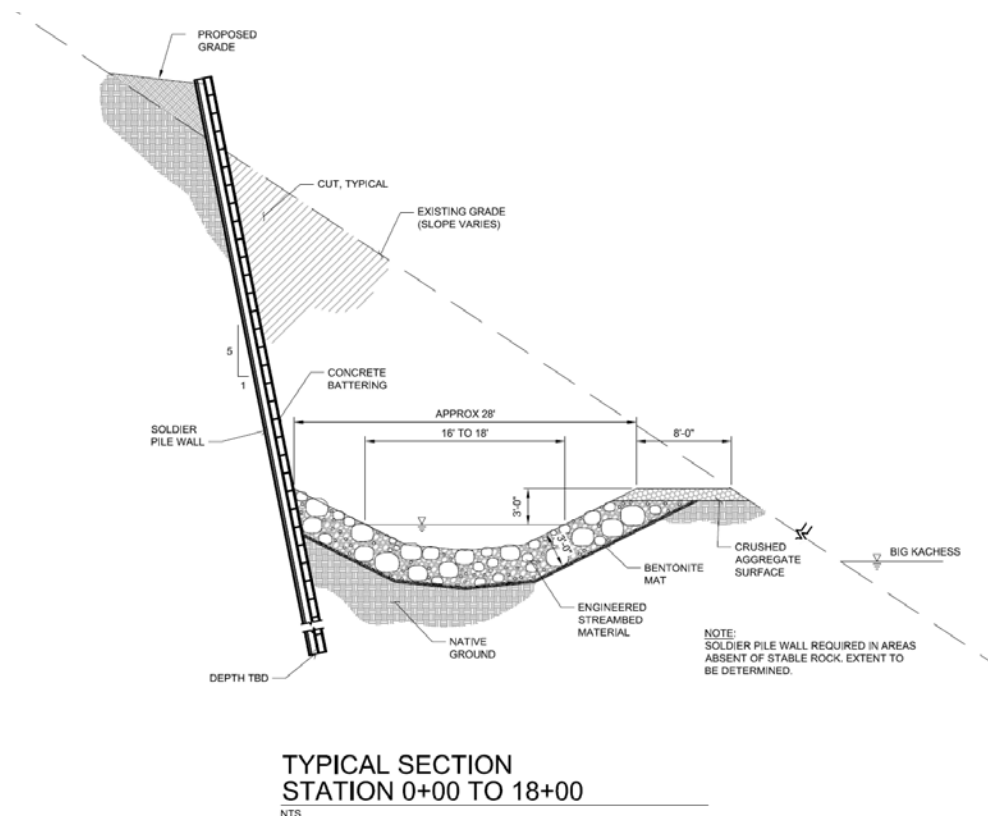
Roughened Channel Cross-Section and Soldier Pile Wall
